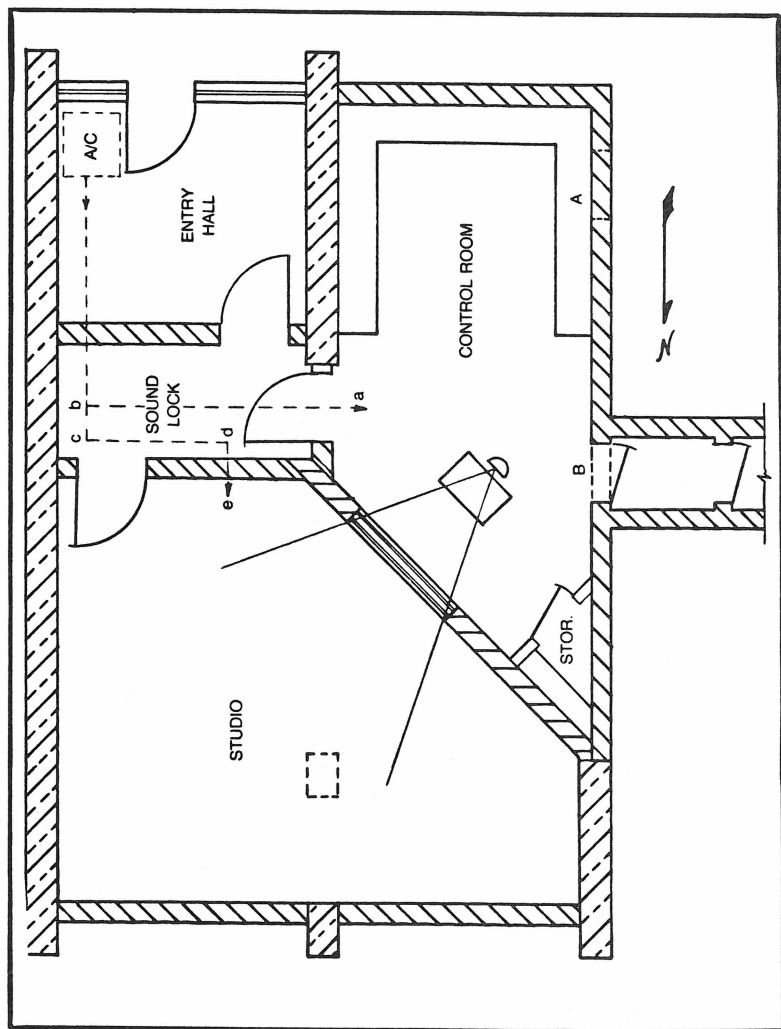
Floor plan of residence converted into studio and control room with sound lock.
